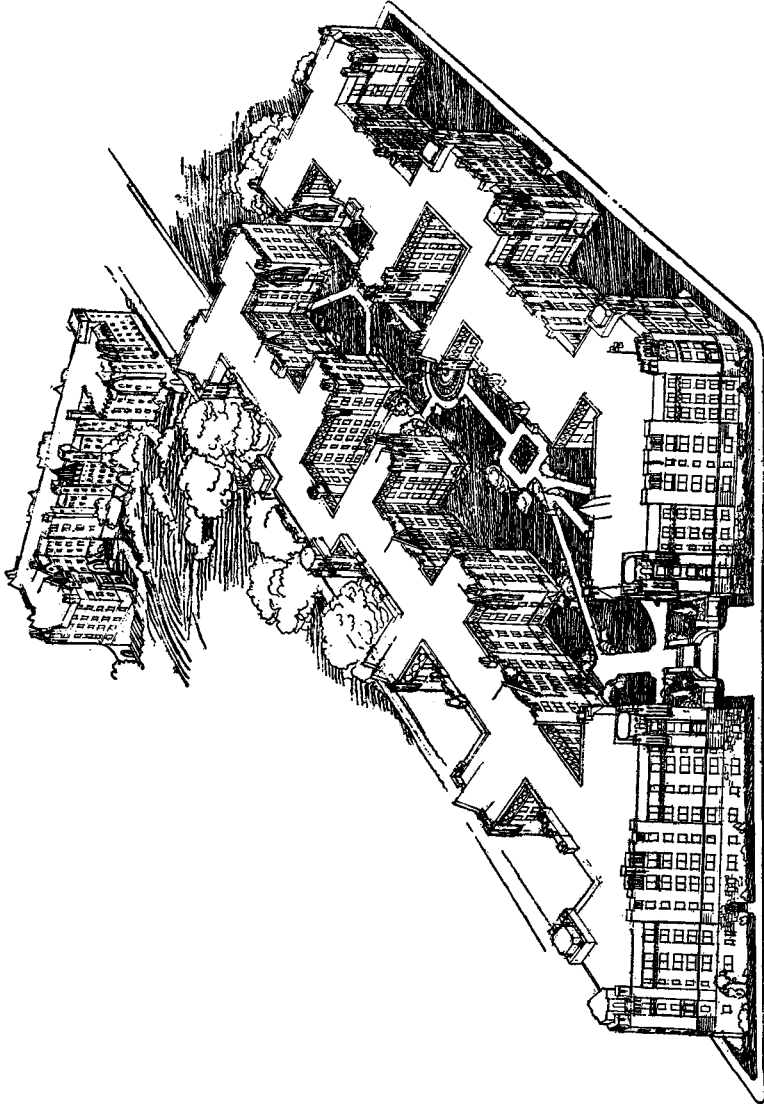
Ground plan of apartment buildings of Amalgamated Clothing Workers
